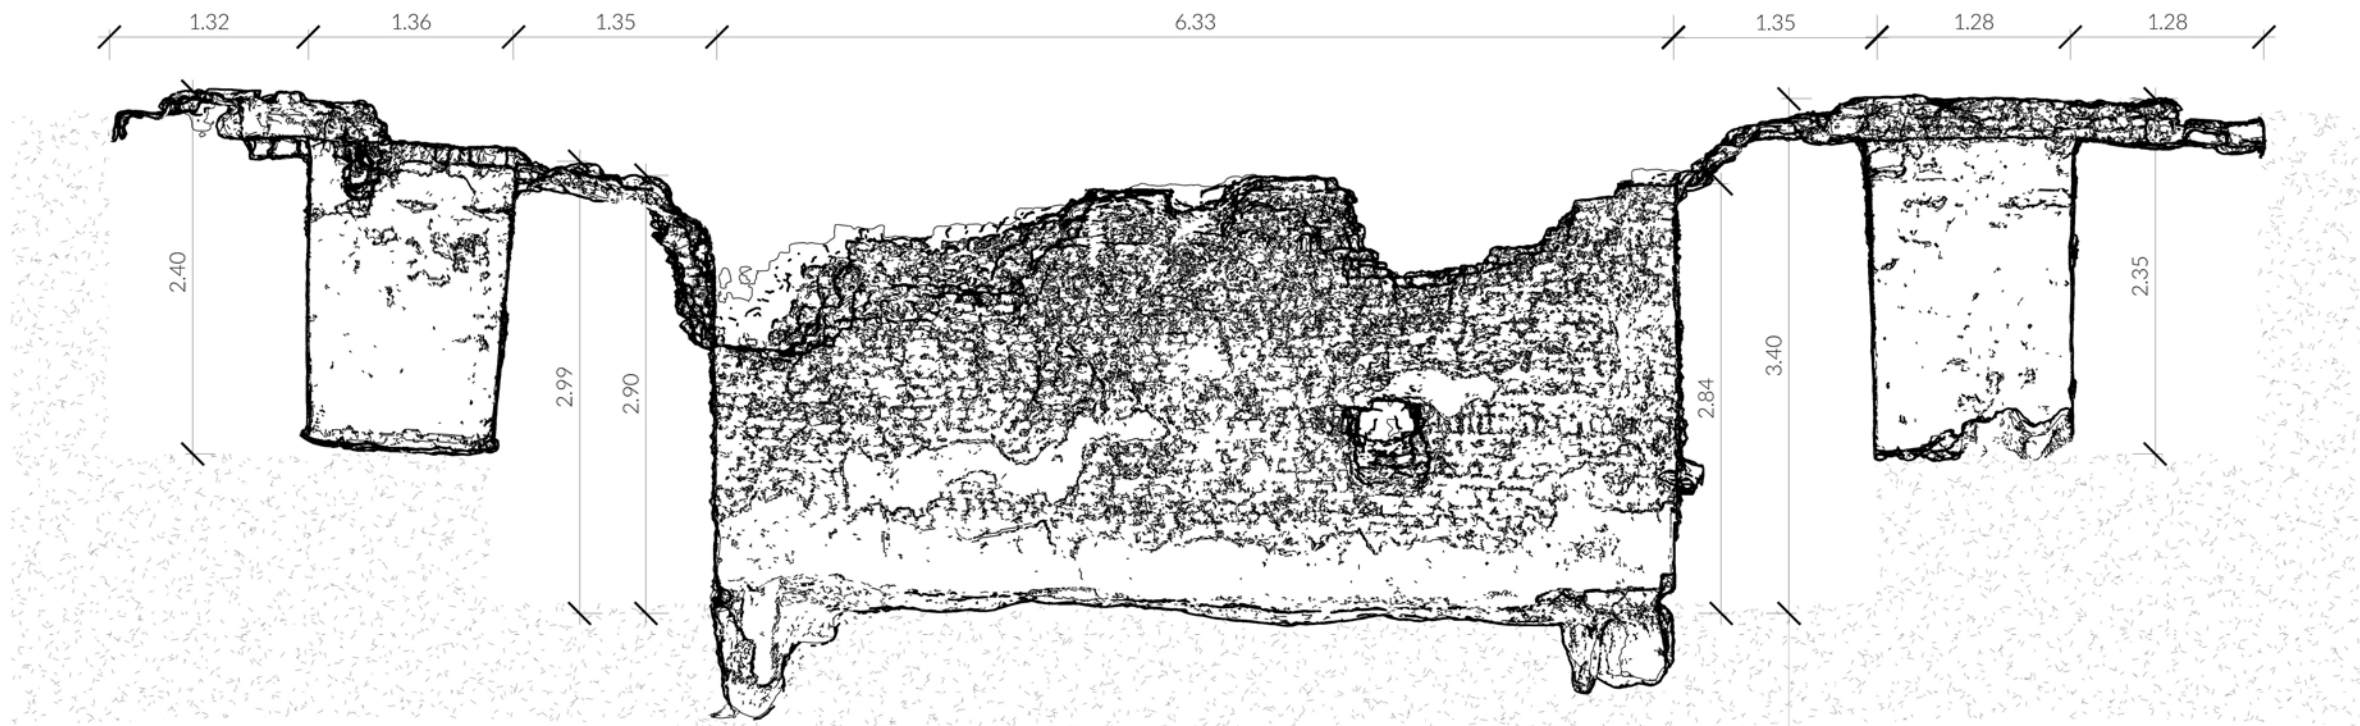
Section through YKK4 - YKK - YKK7, west walls, 1:50
